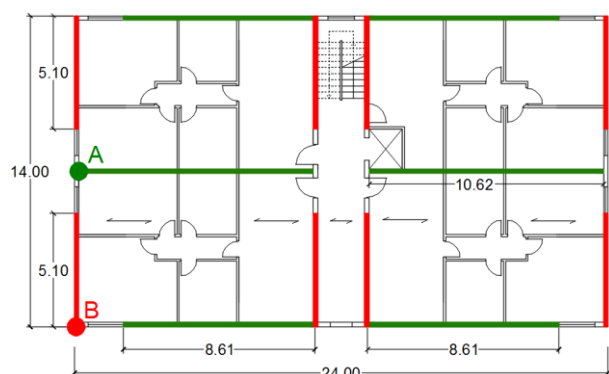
Case study – Floor plan layout: structural walls in X direction (green) and Y direction (red)
